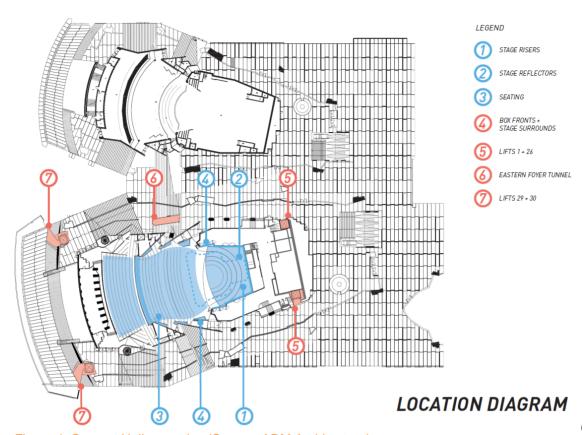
Concert Hall upgrades (Source: ARM Architecture)
